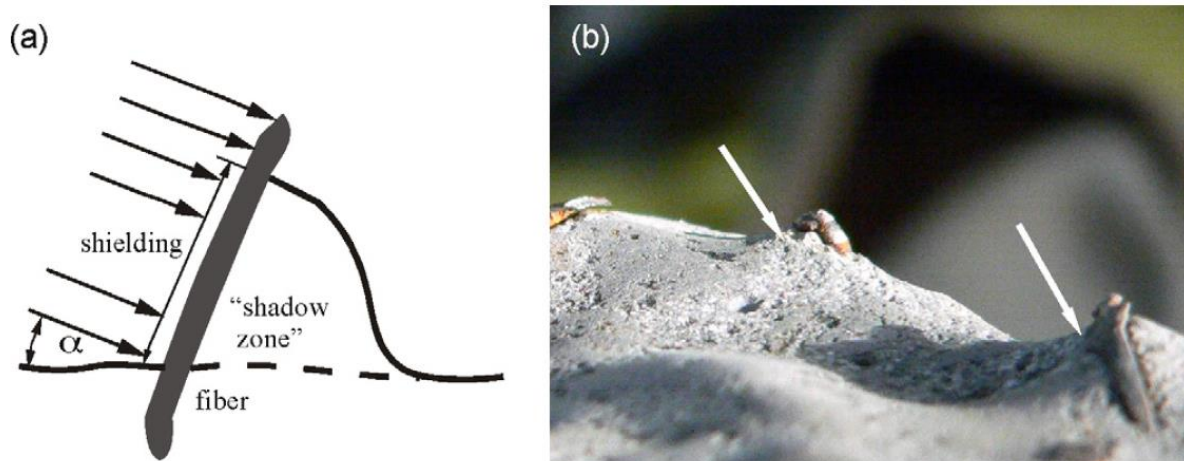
Shadow zone formed with steel fibres shielding concrete [21].
